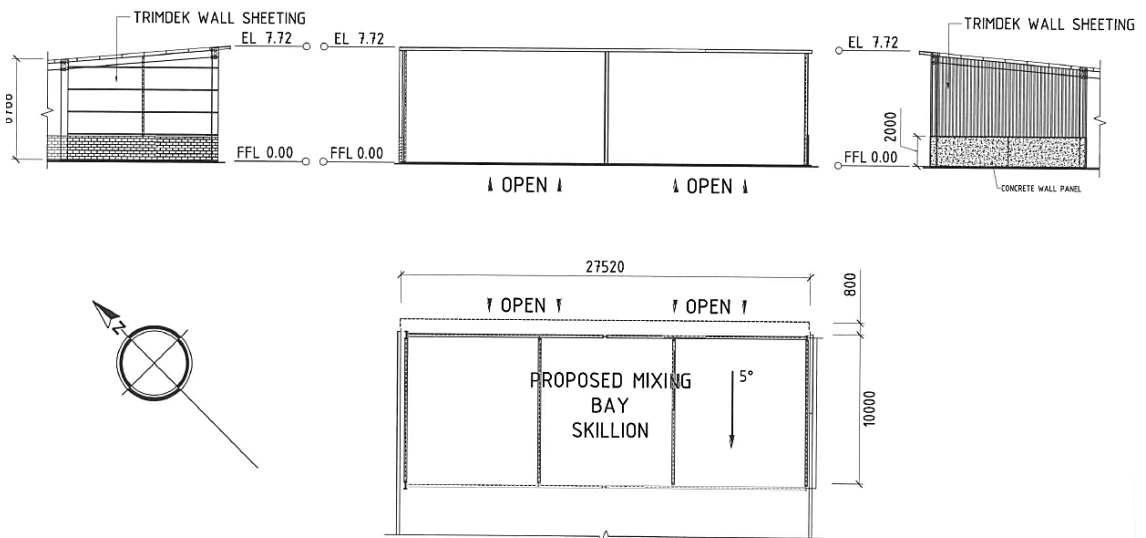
Extract of drawings showing awning addition (Source: Glenwood Rural Buildings, 2025).
